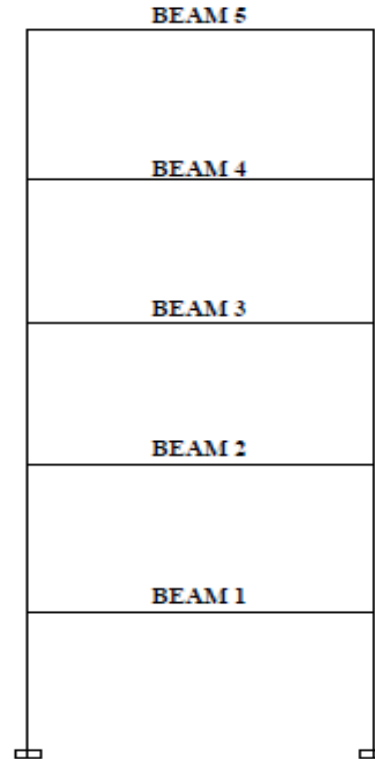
shows the 2D single bay frame of 5 storey building.
